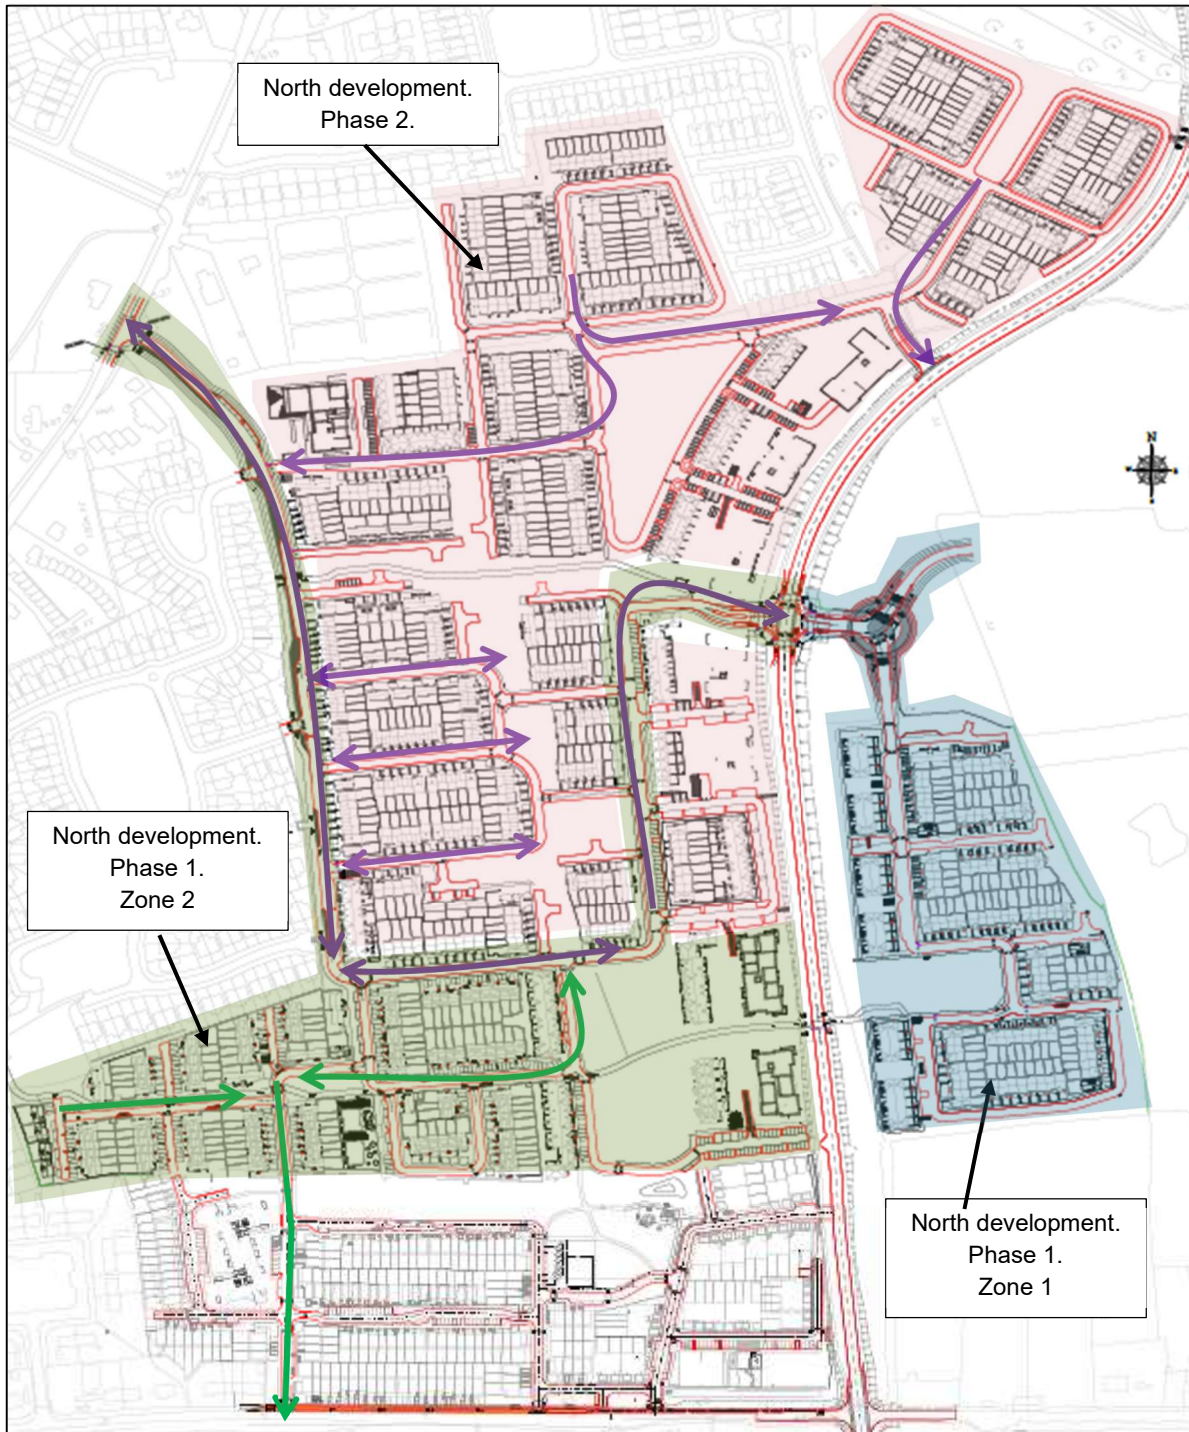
| North Development – Impact on the Junction New Road – DDR – Do Nothing 2029.
